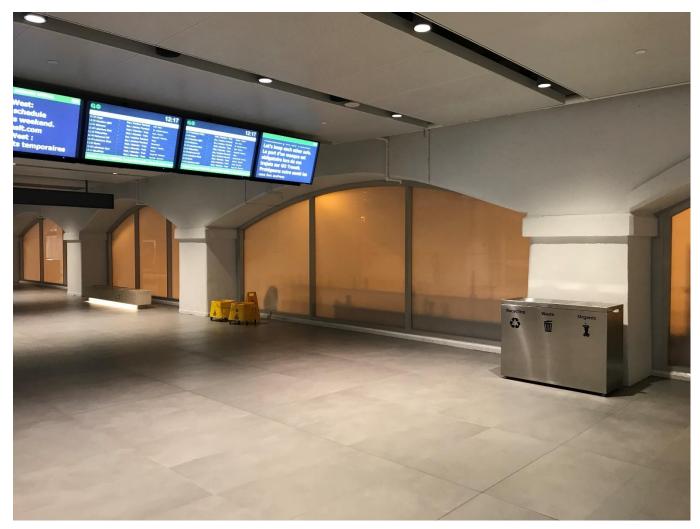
Interior of the East Teamway showing columns and segmentally arched openings in good repair. The columns and arches have been coated in white protective sealer and the glass panes have been replaced.
